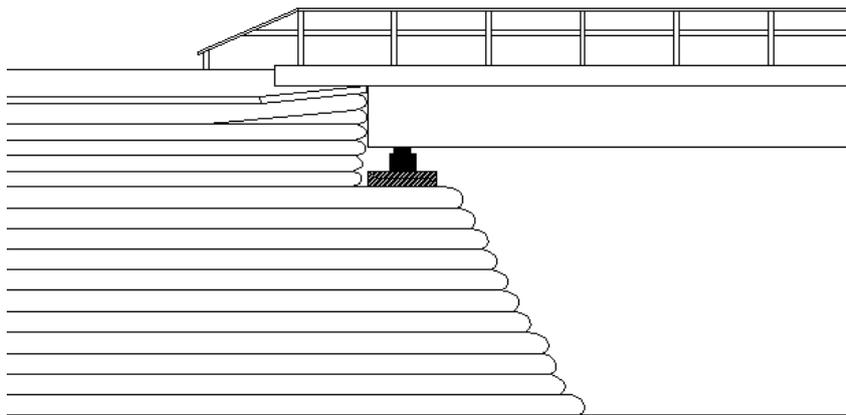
An elevation showing principles for the proposed foundation and substructure of the bridge.
